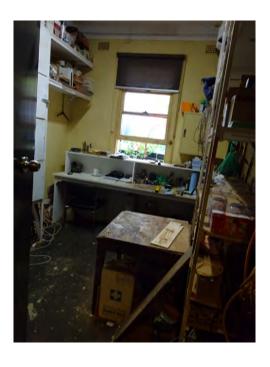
Existing hotel accommodation reception - first floor 2018 Architectural Projects
